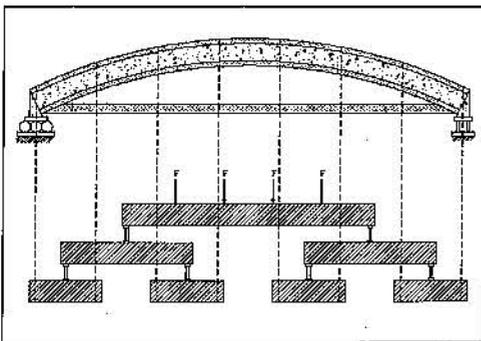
(a). Schematic sketch of the test set up showing the testing of the structural properties of the full size arch specimen
